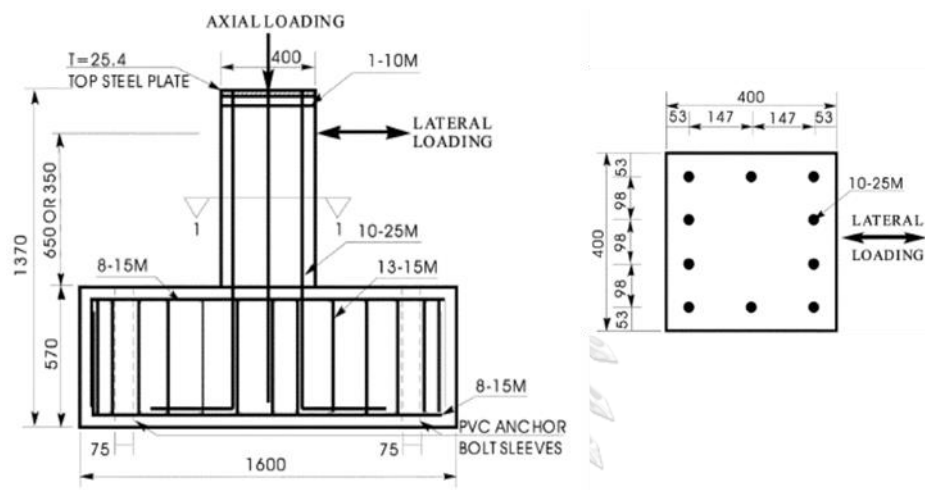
Specimen reinforcement details (J. Liu et al., 2011)
